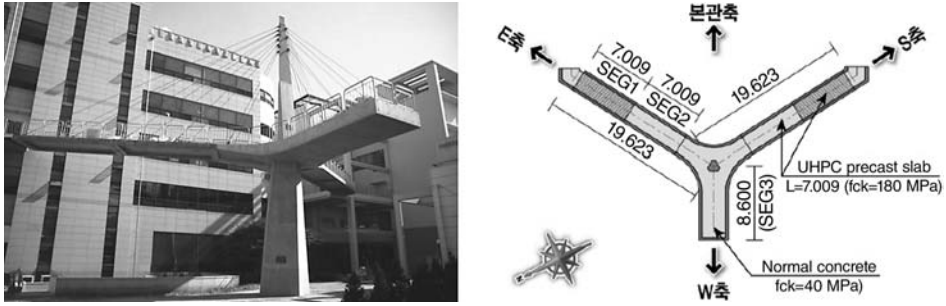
View of cable-stayed footbridge between two office buildings and plan on bridge [151]
